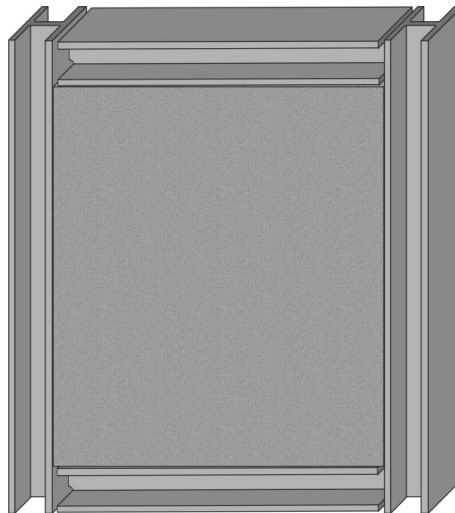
CONCRETE WALL AND BOUNDARY ELEMENTS
